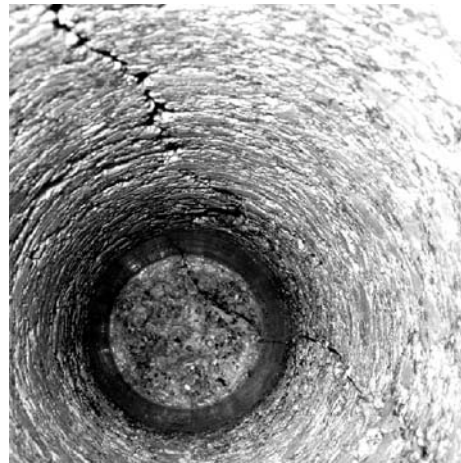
Crack along wall and bottom section of the hole left from the extracted core.
